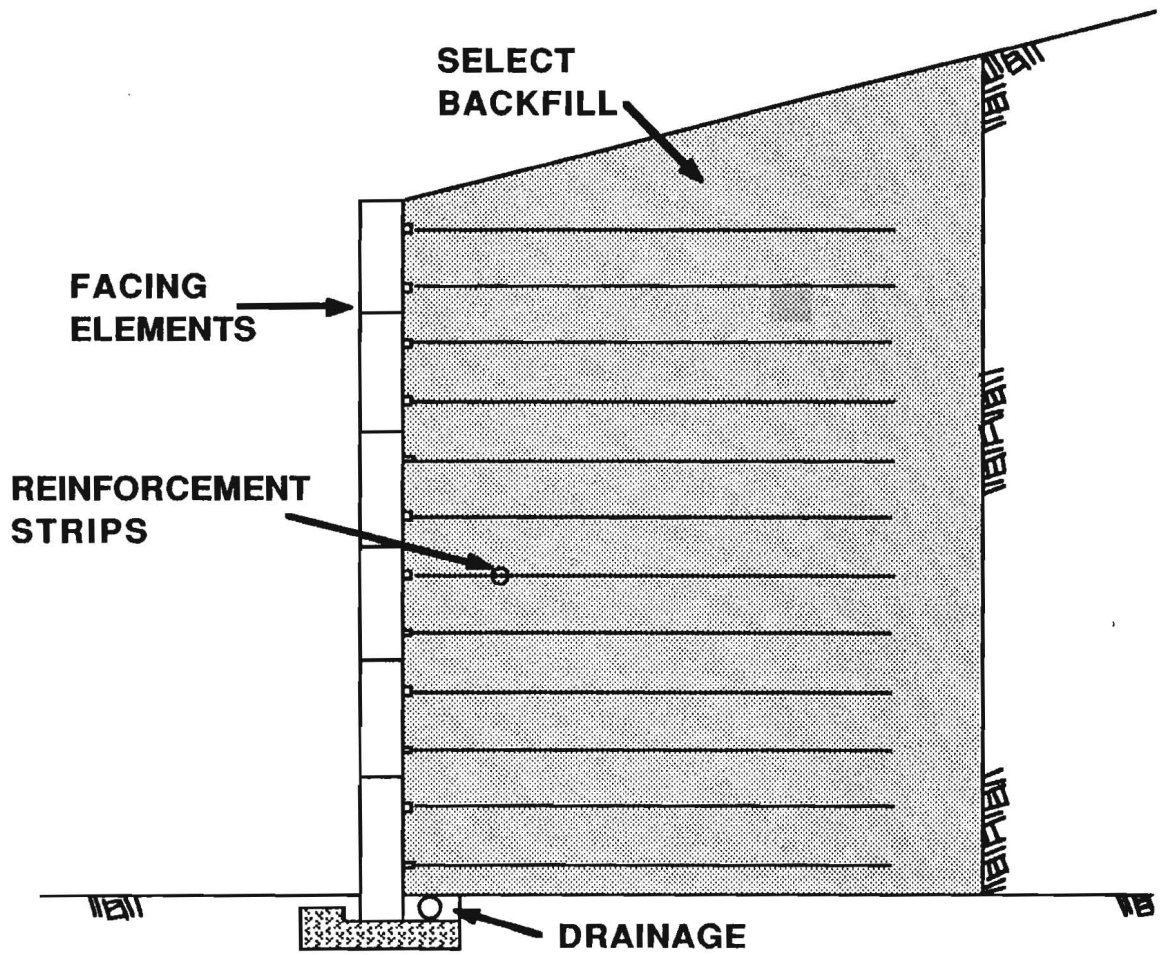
The typical reinforced soil retaining wall configuration.
